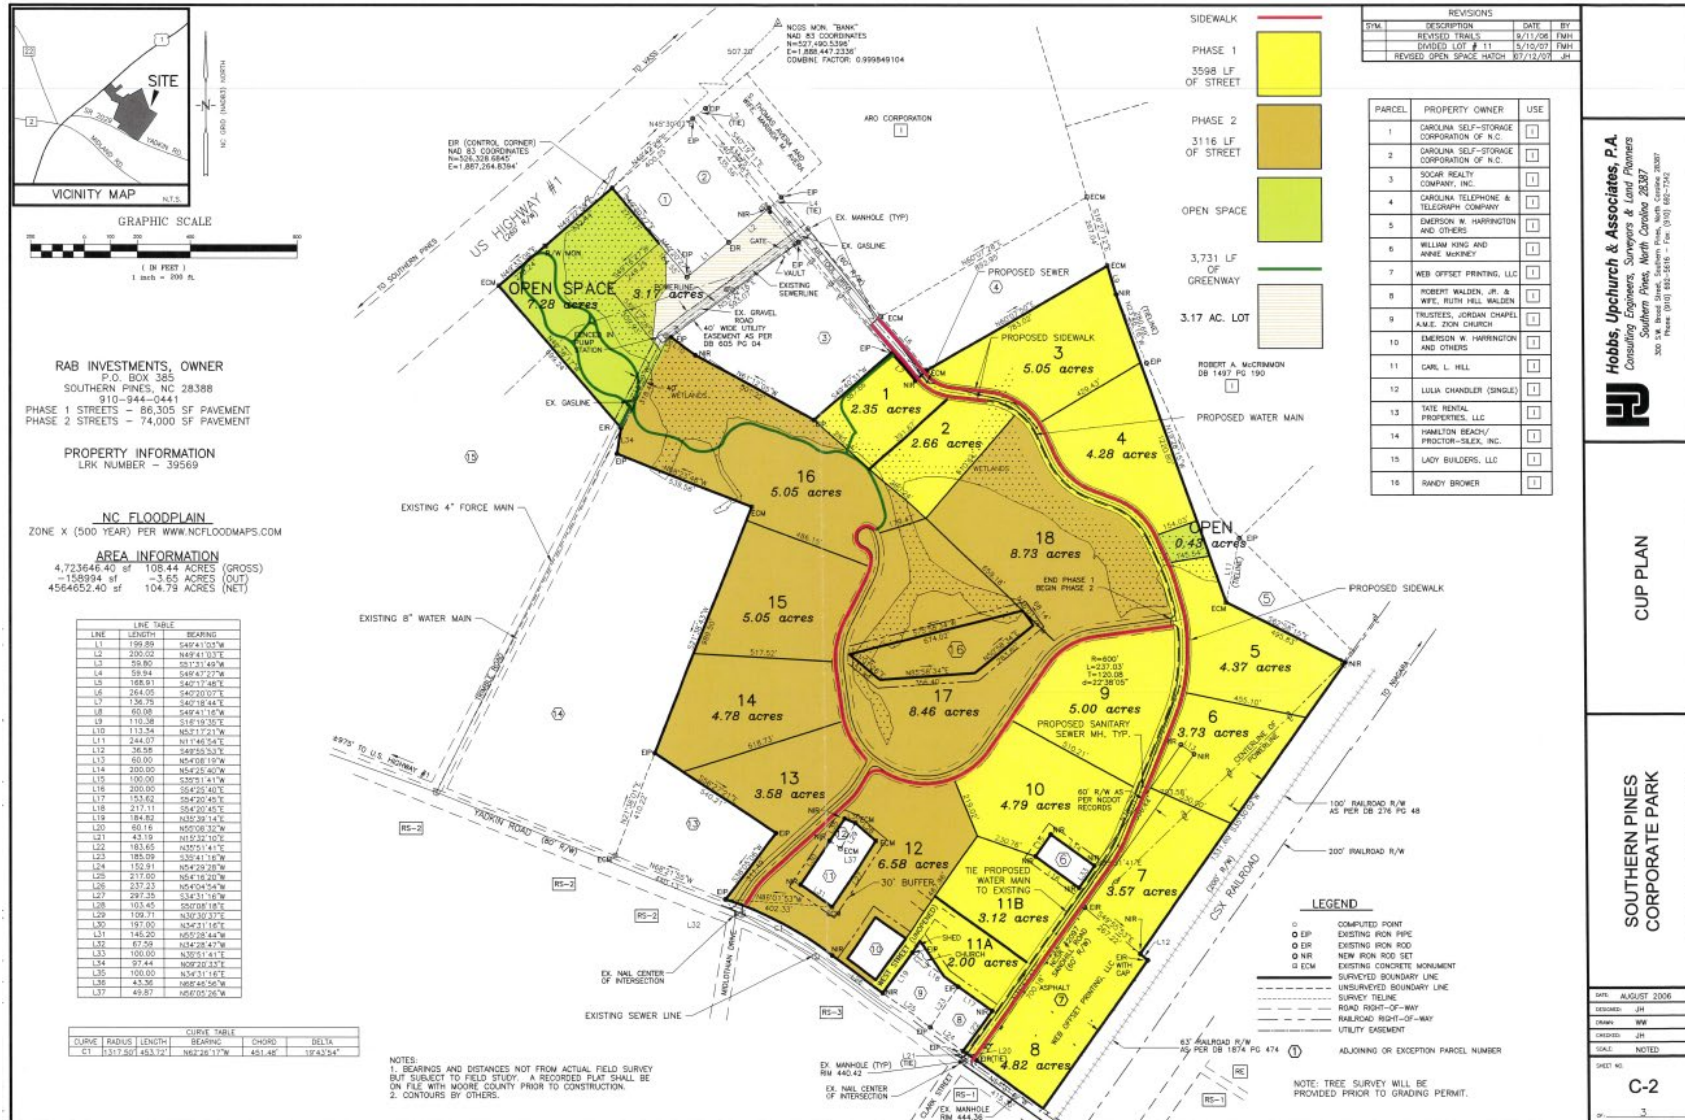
Southern Pines Corporate Park Phasing Plan, Open Space Plan, and Park Improvements
